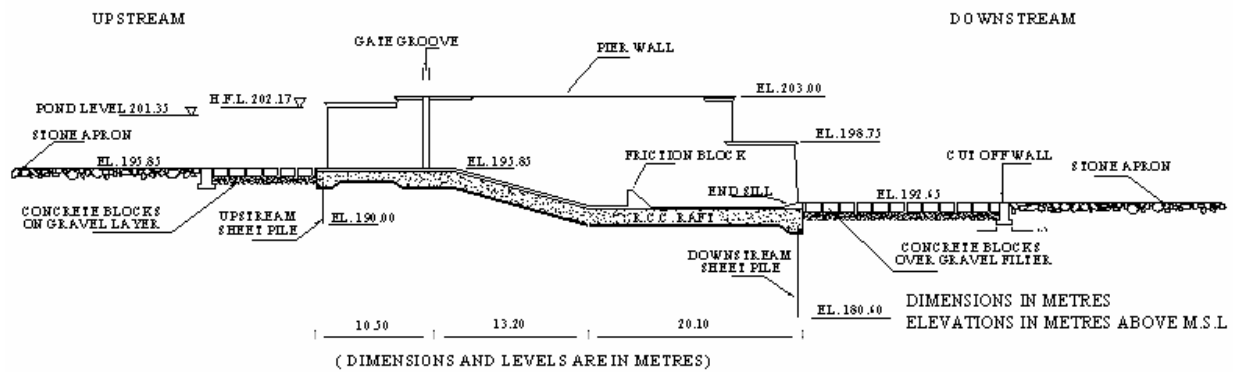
(c) Section through undersluice bay of Okhla Barrage (plan shown in Figure 1.1(a) )
